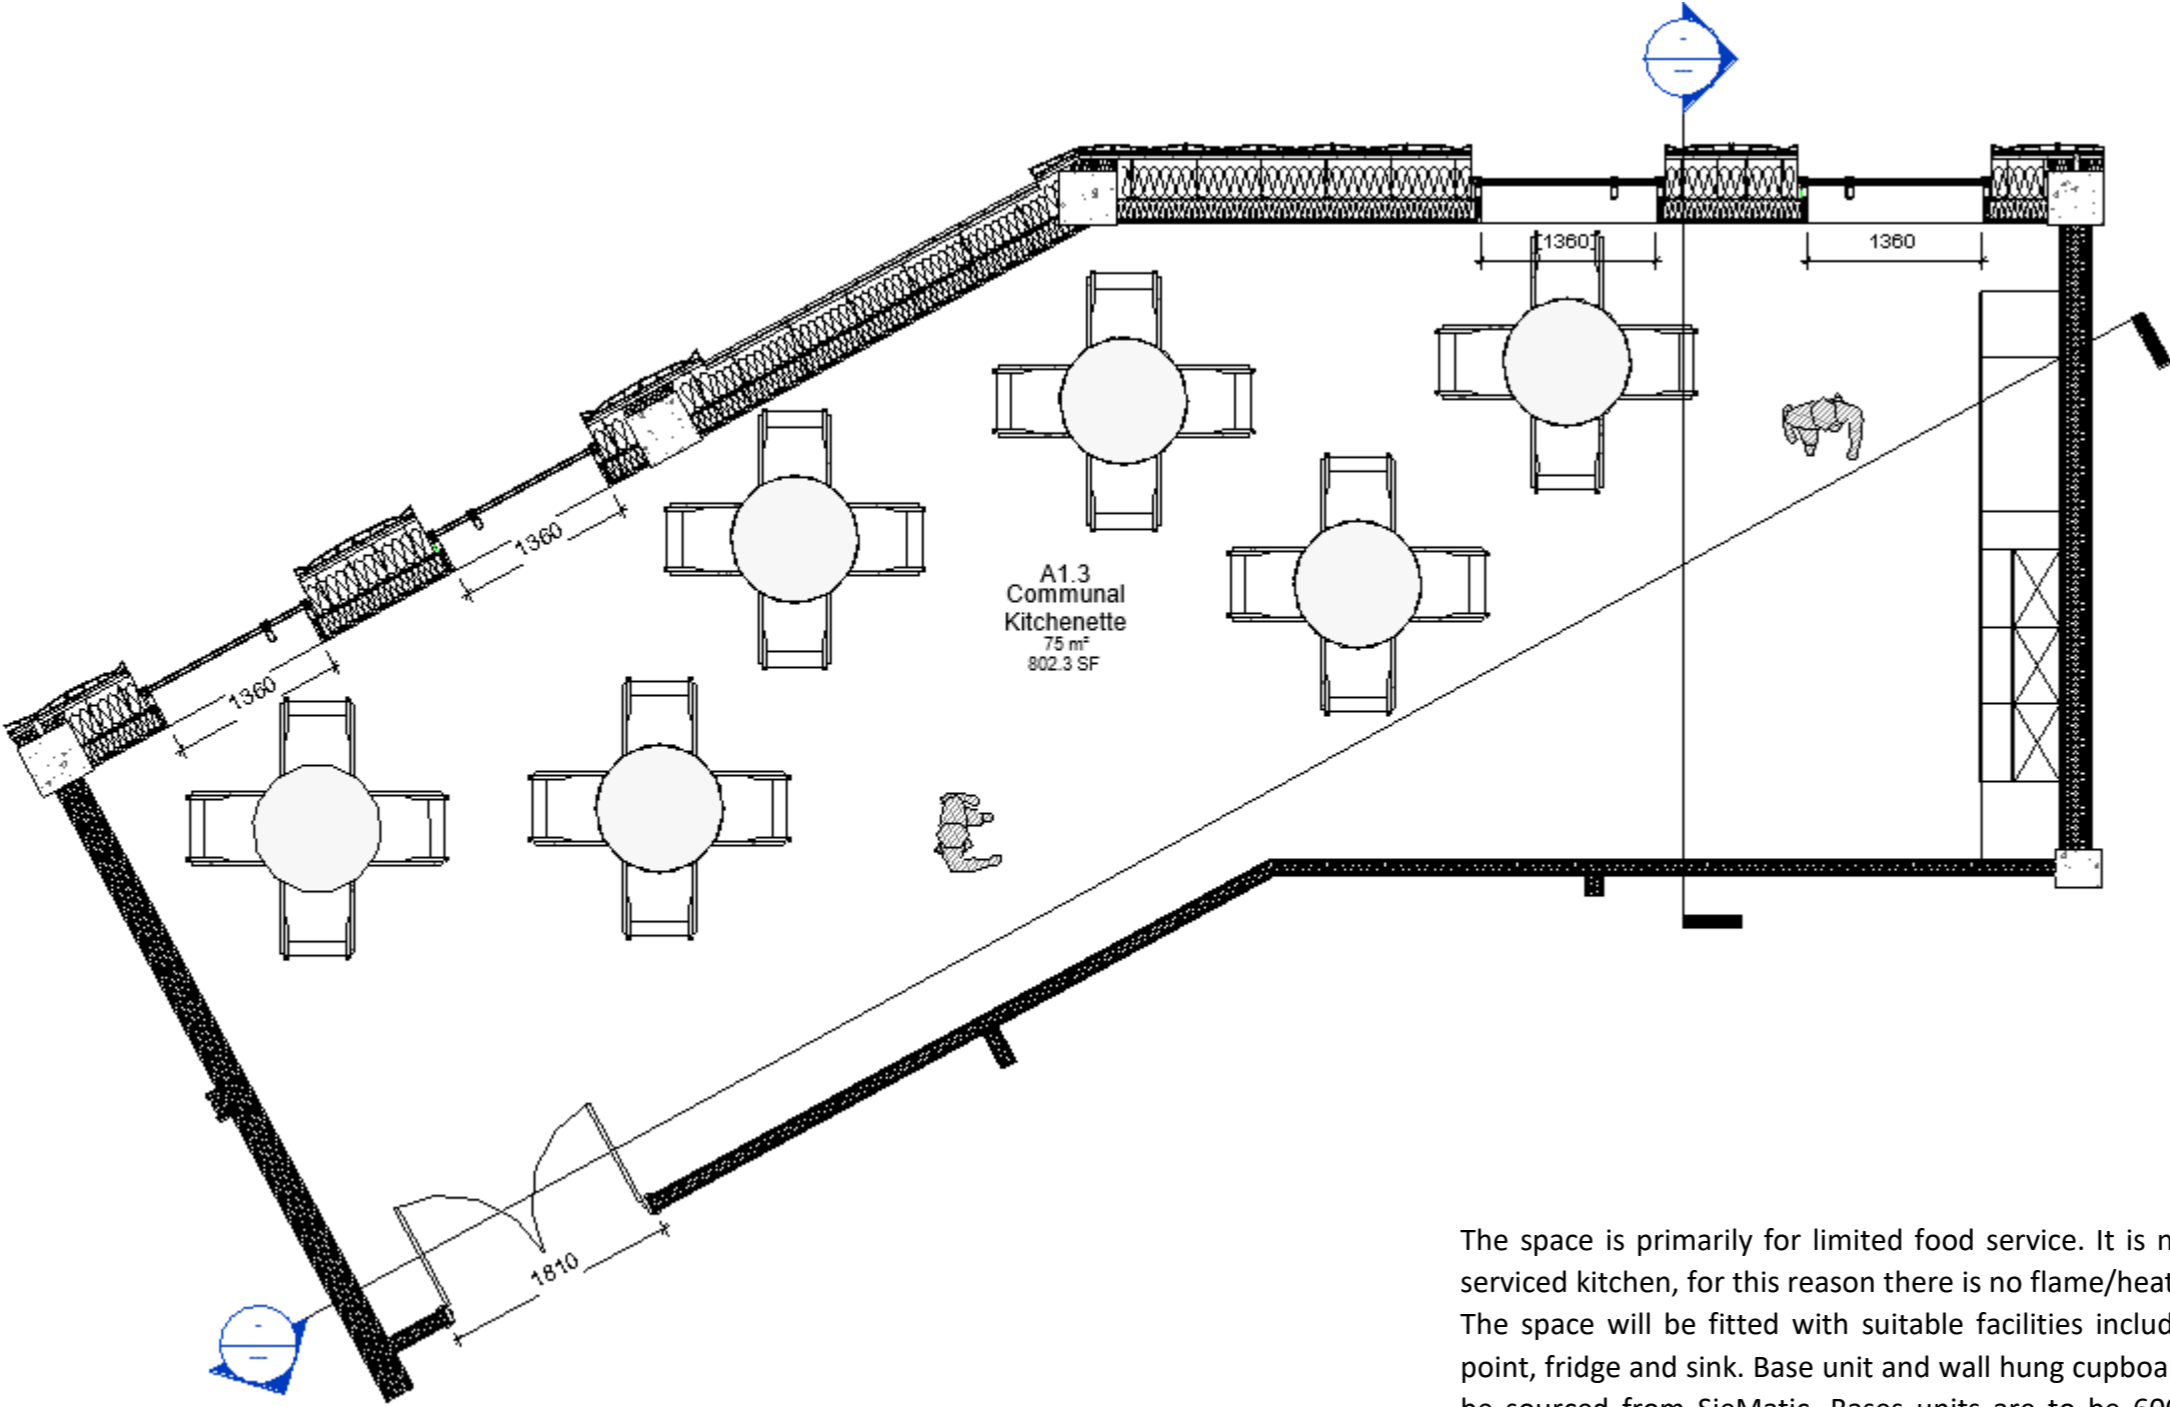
Enlarged Communal Kitchenette Plan (Author, 2021)
